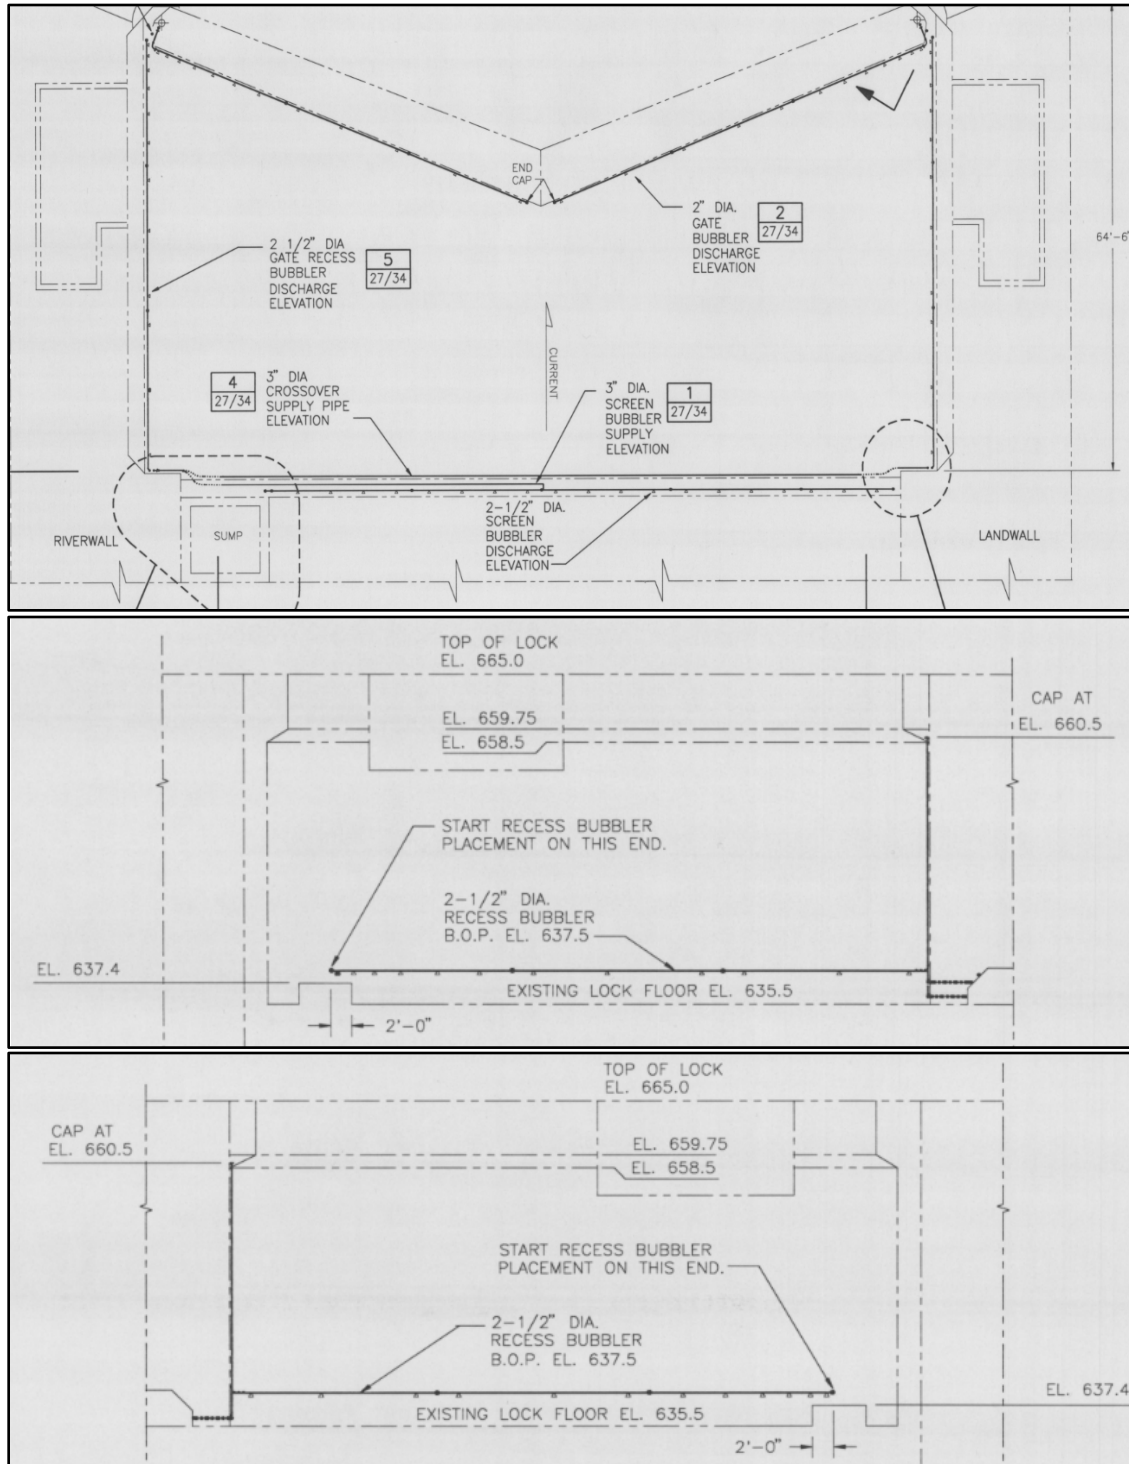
Detailed view of Lock and Dam No. 05 Lower Lock Chamber Bubble System. (USACE 2025c)
